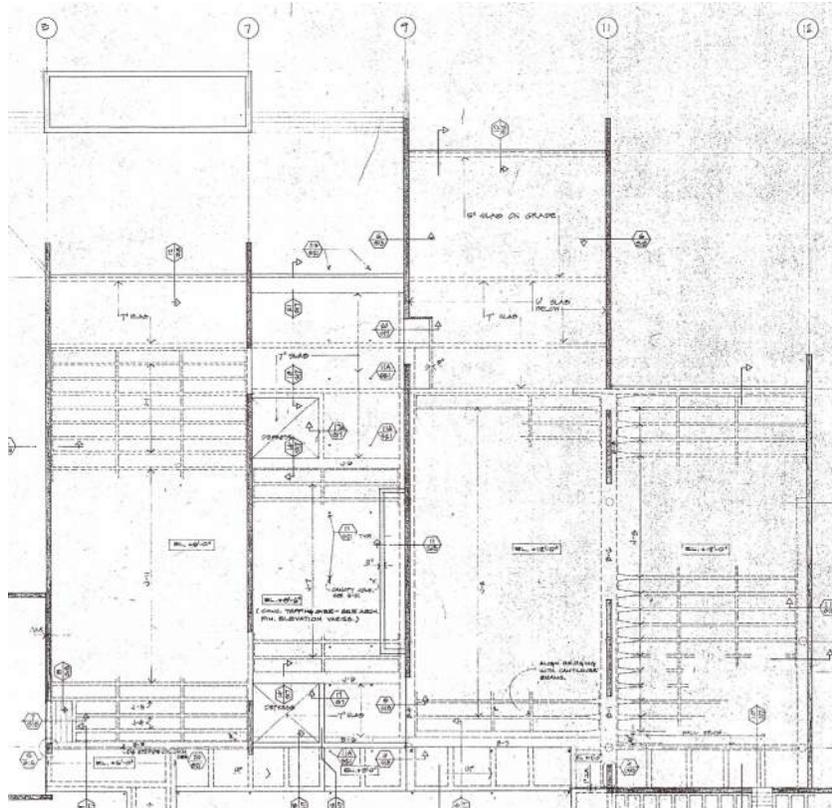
Building 5 & 6 & 7 Typical Roof Plan
